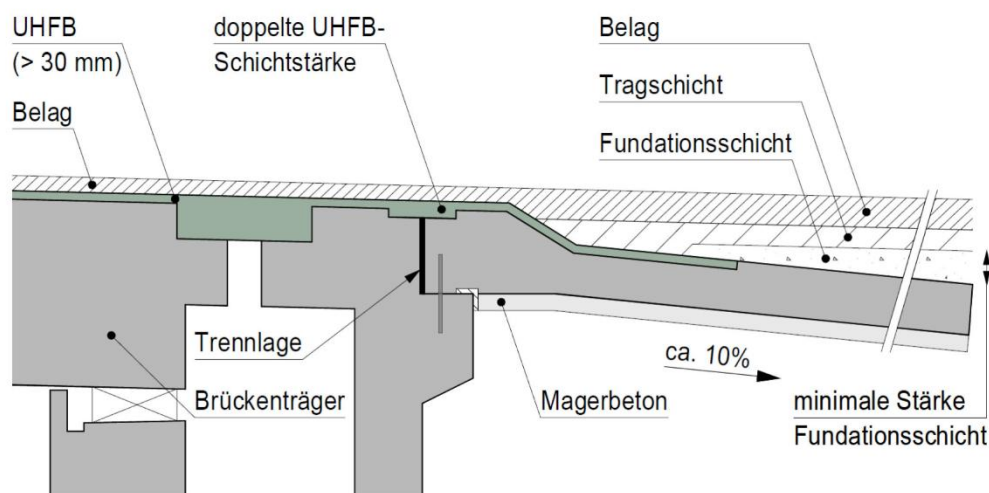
Monolithic connection of bridge girder, abutment, and approach slab (e.g., semi-integral bridge end with bearing, without expansion joint) [12].
